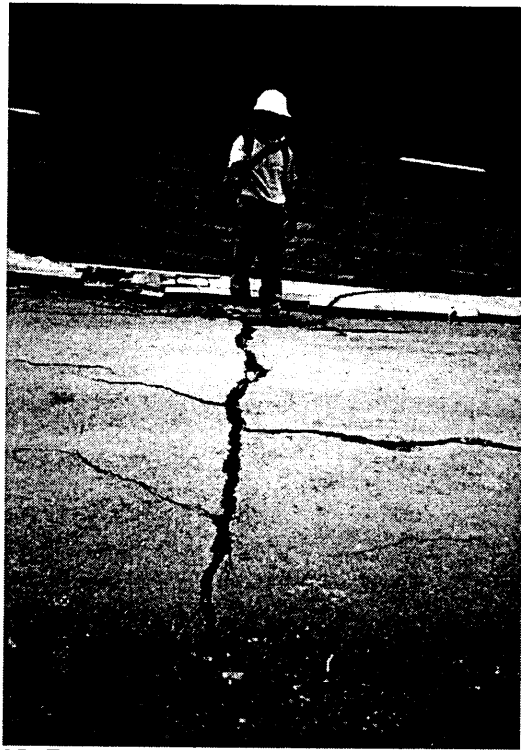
Extension cracks on the pavement in Yakin Street
